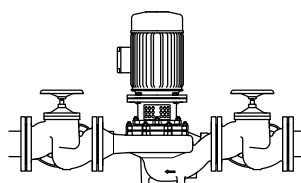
Vertical installation / mounted without pump foot, sizes 032-032-160 to 100-100-125
